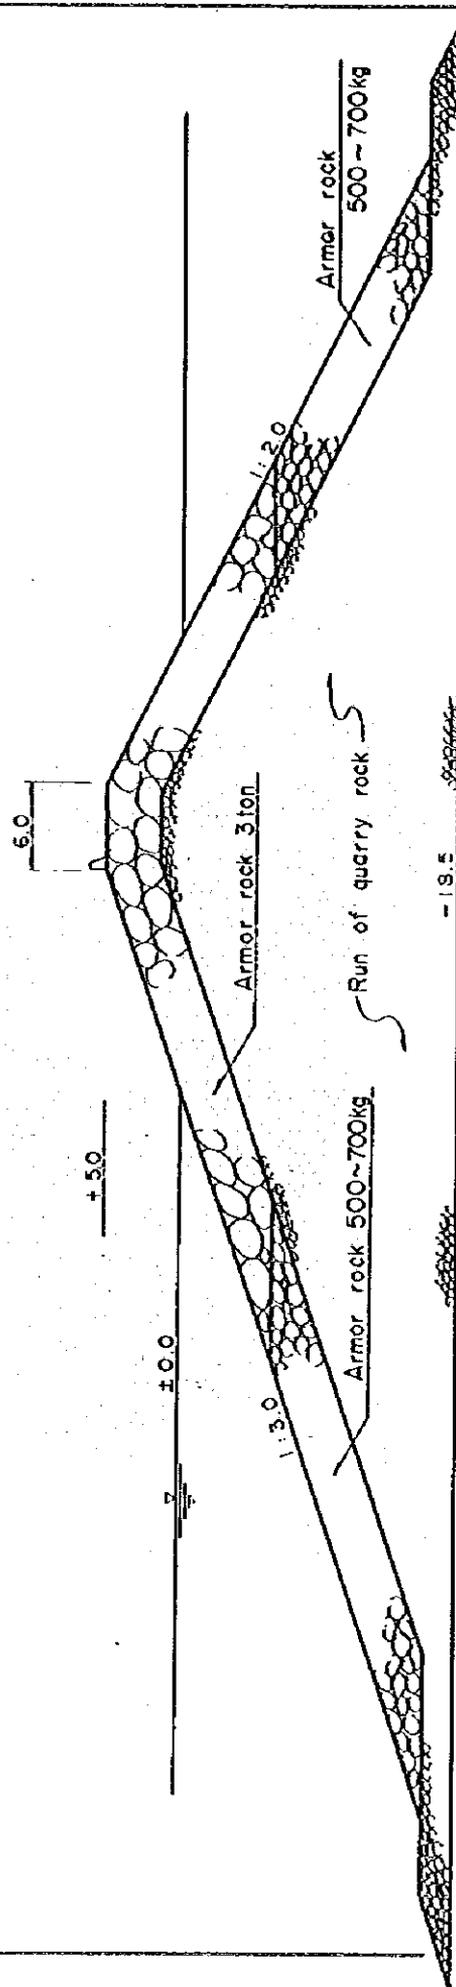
TYPICAL SECTION OF BREAKWATER FOR ROBERTSPORT SITE / ALT. I
